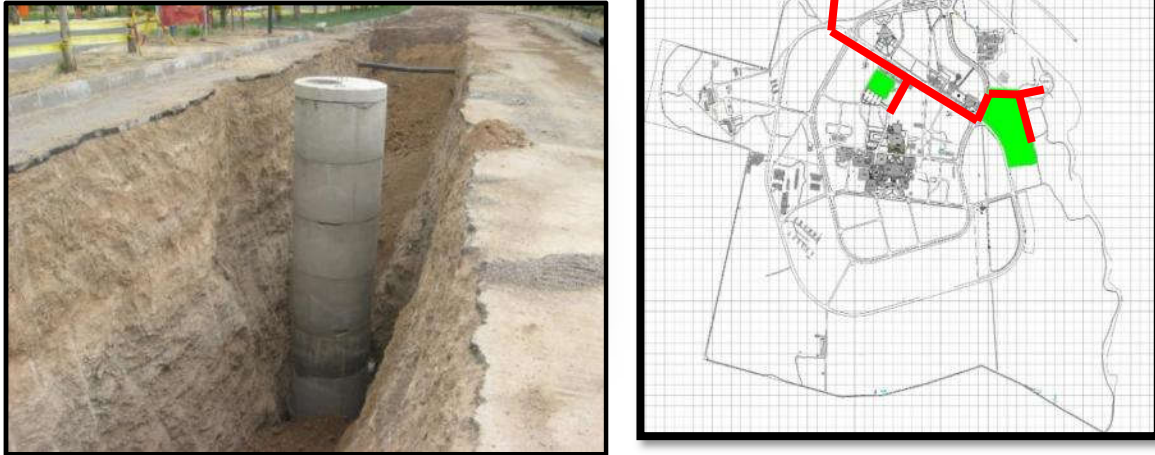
University Sewage 1st Line and a Typical Prefab Concrete Manhole
